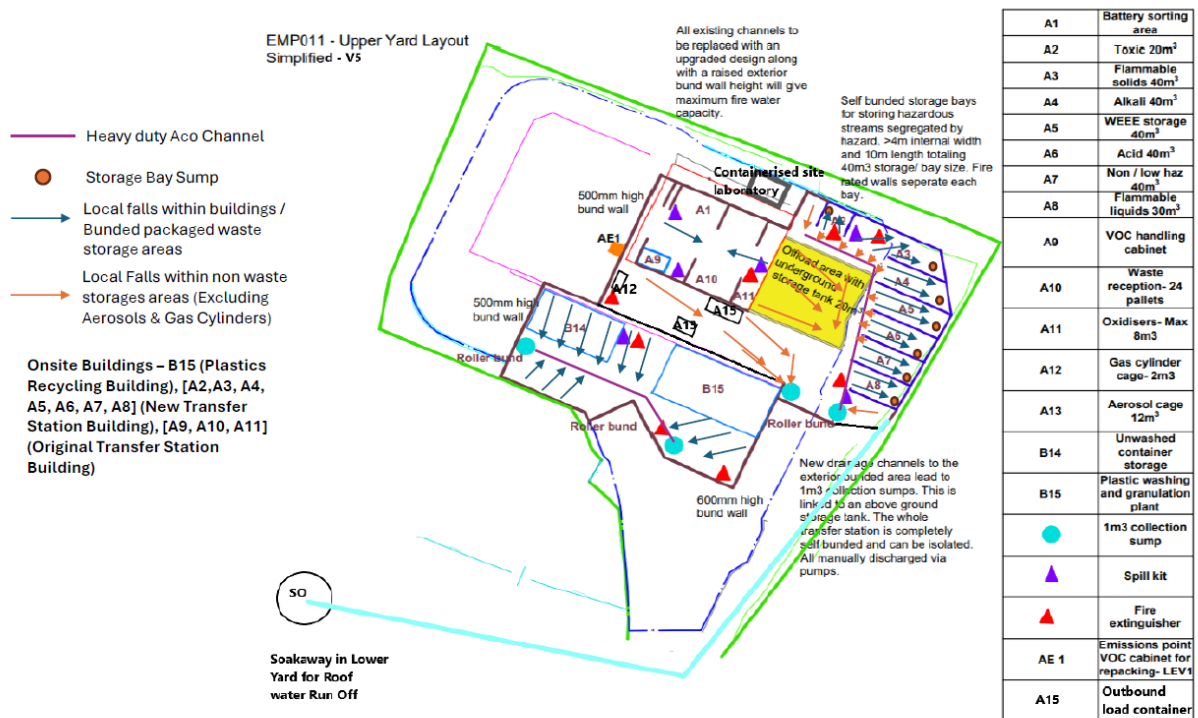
Plastics Recycling area (B) and Hazardous waste Transfer station (A) layout drawing
